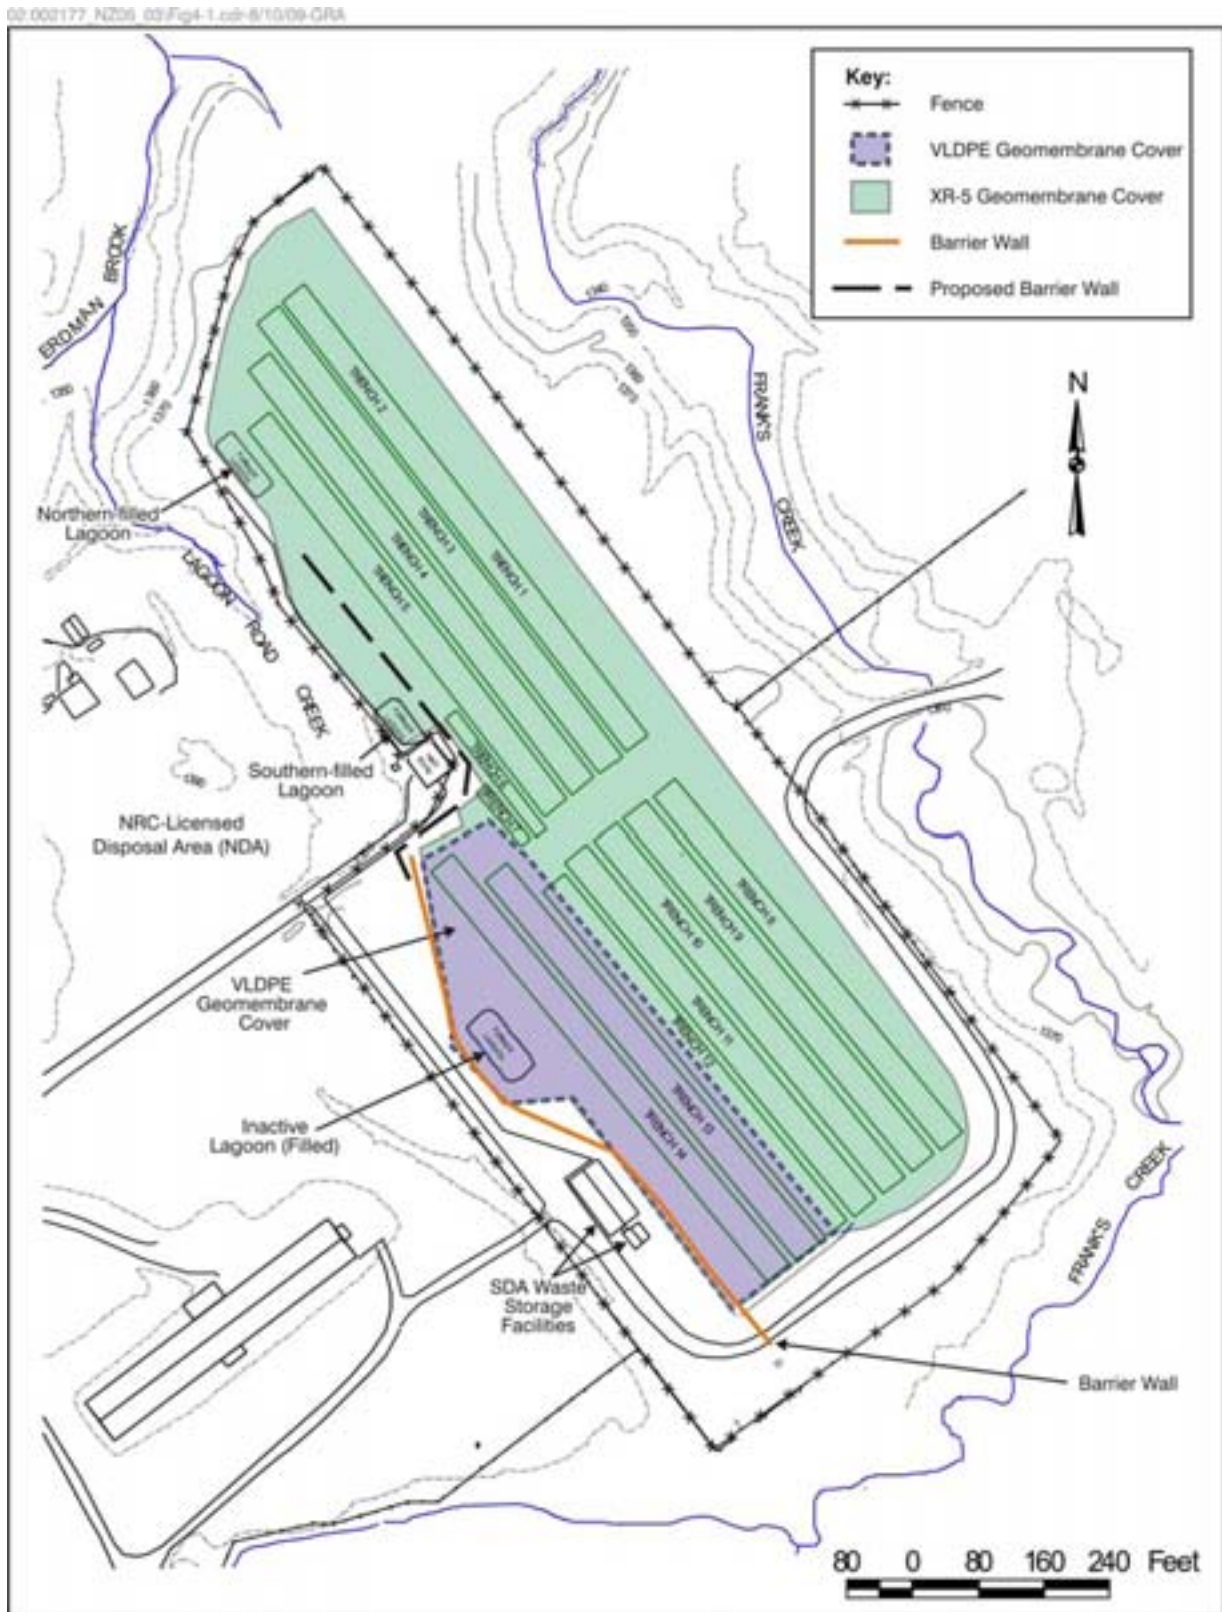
Proposed Barrier Wall Extension State-licensed Disposal Area (SDA)
